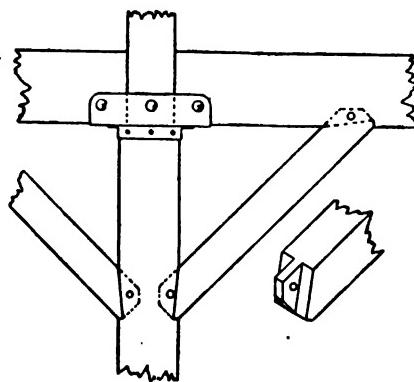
Bracing of Wooden Post to Wooden Girder.
